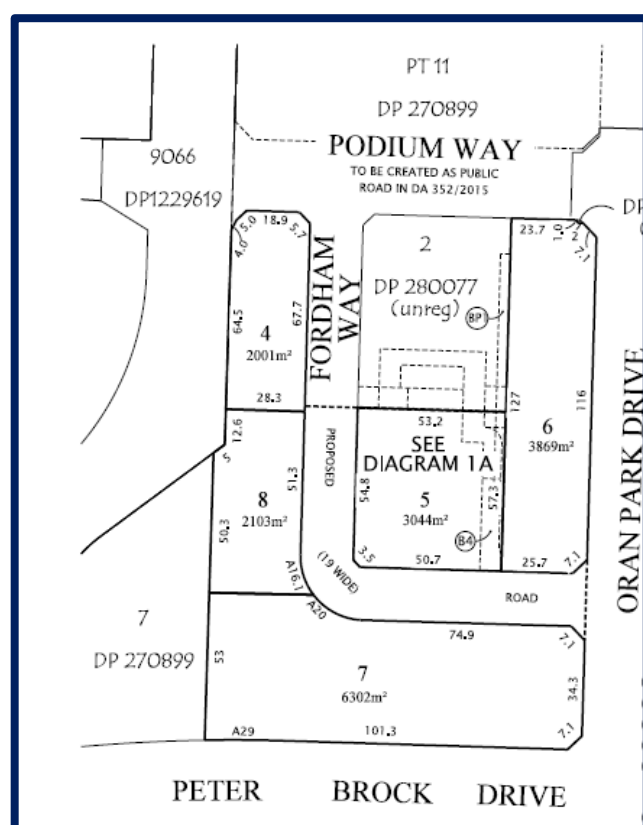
Approved subdivision under DA/2019/609/1. The future subject site is shown as lot 5.
